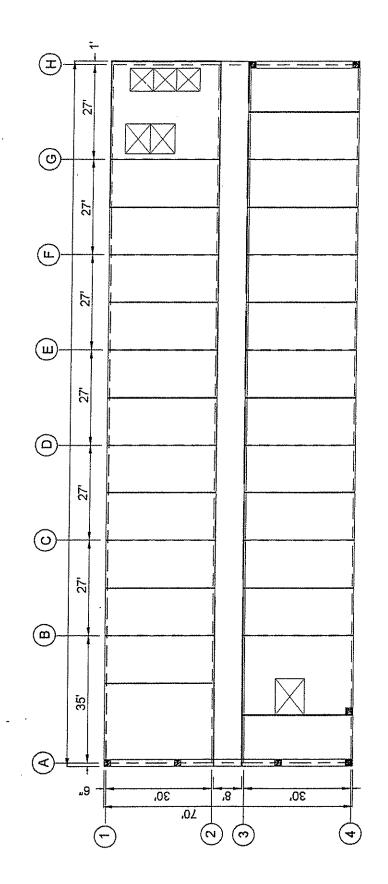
Typical Floor Plan of PRESSS Ductile Frame Systems (Taken from Ref. [1-26])
